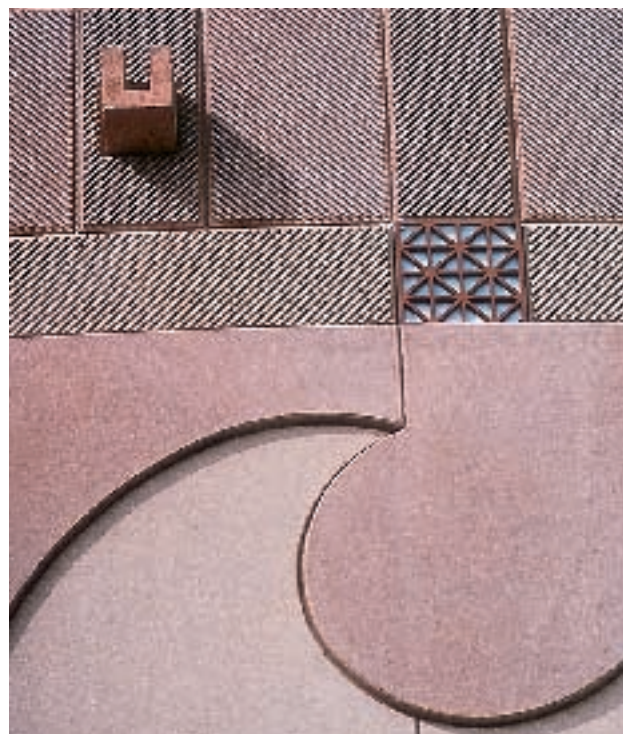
This detail of the north wall shows the precast concrete panels inset with a wave pattern and the GFRG window screens. Courtesy: Gustavo Ferrari.
